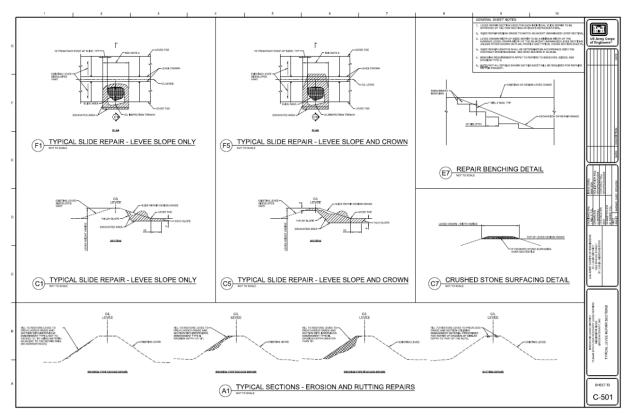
Construction diagram of typical slide repairs and erosion and rutting repairs.
